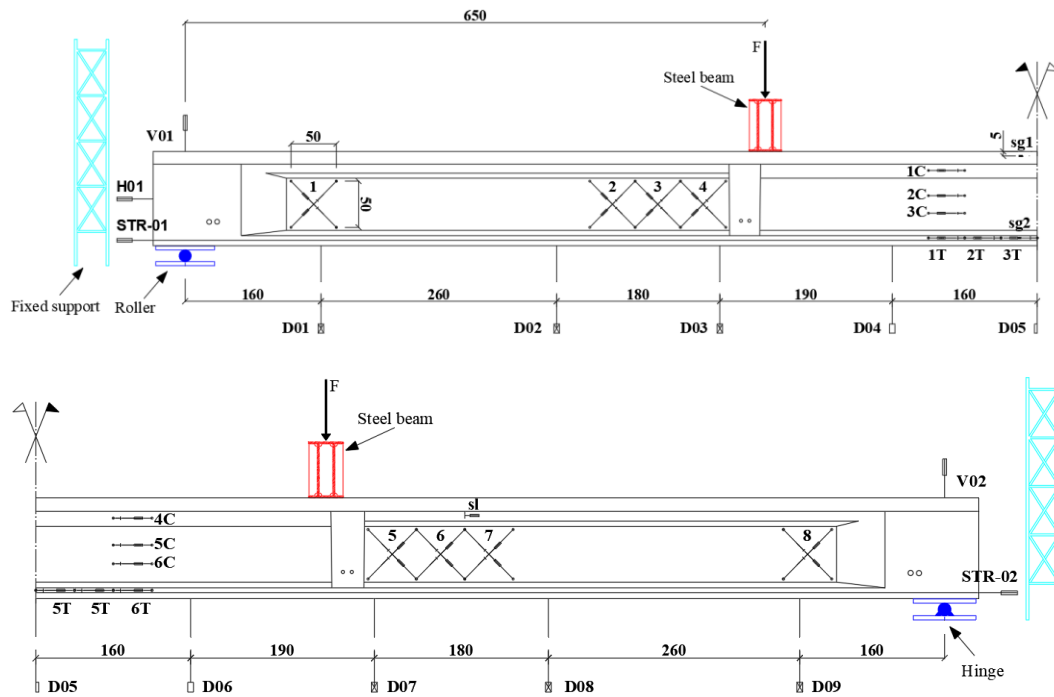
Test setup and layout of the monitoring system installed on B5-P47/P46 girder (unit: cm).
